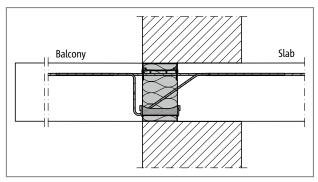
Schöck Isokorb® XT type K: Connection with single-leaf masonry
